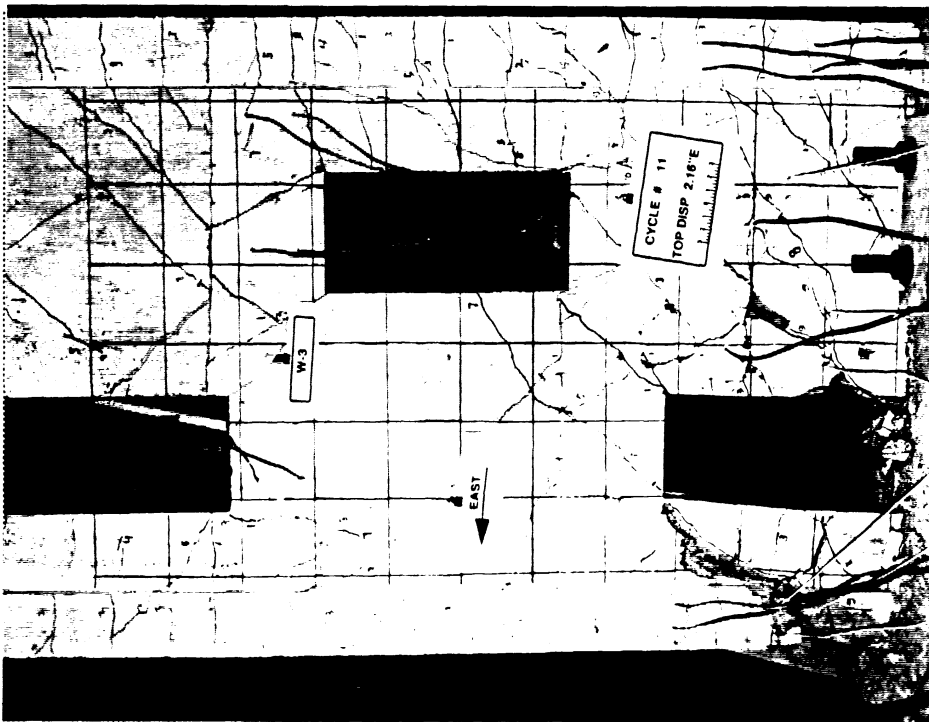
Crushing and Spalling of Concrete on Either Sides of Opening weakens the Specimen W-3 during Cycle 11.
